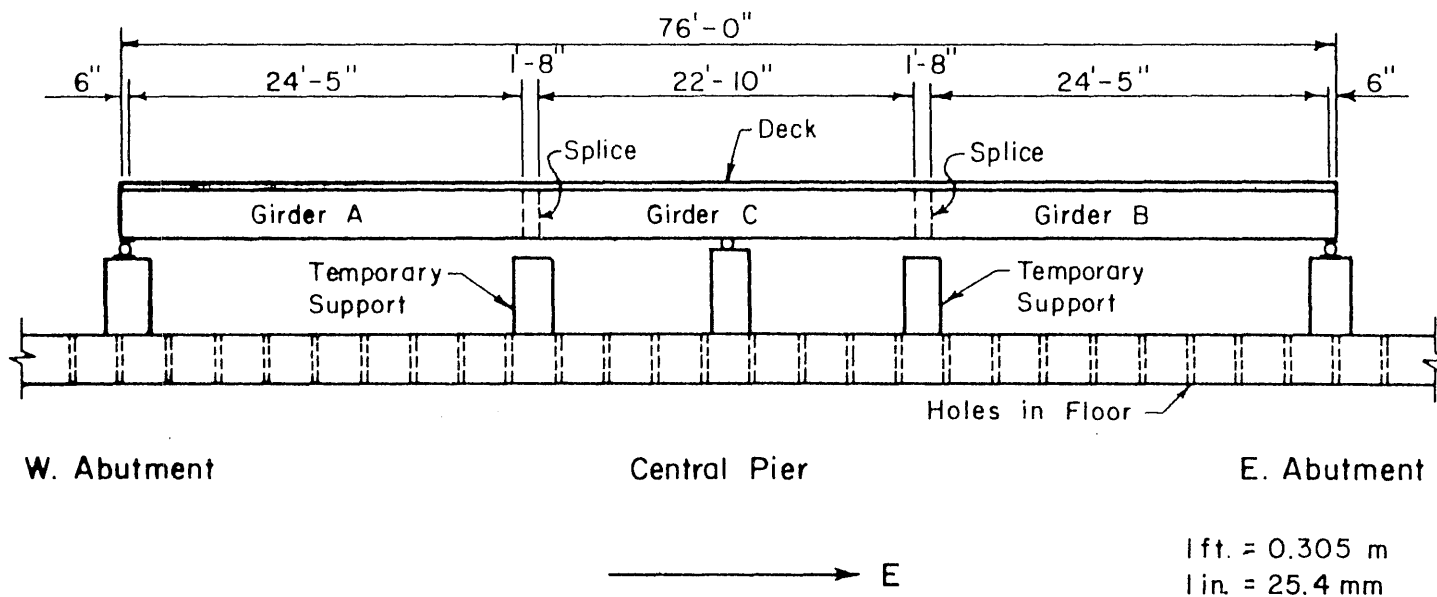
LAYOUT AND DIMENSIONS OF MODEL 2
